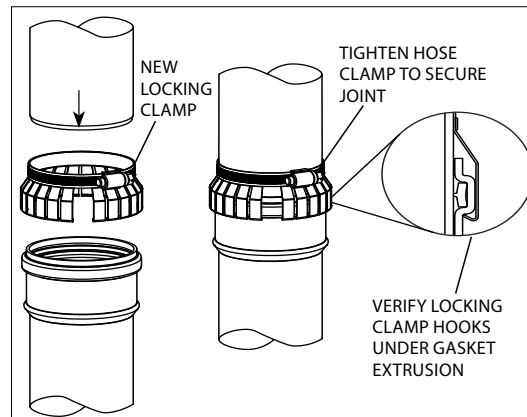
Screws are not allowed for joint connection. Never penetrate the wall of PolyPro Single-Wall vent pipe. (Exception: a stainless steel screw may be used outside the building on exterior terminations and exterior joints to orient an elbow, etc).
